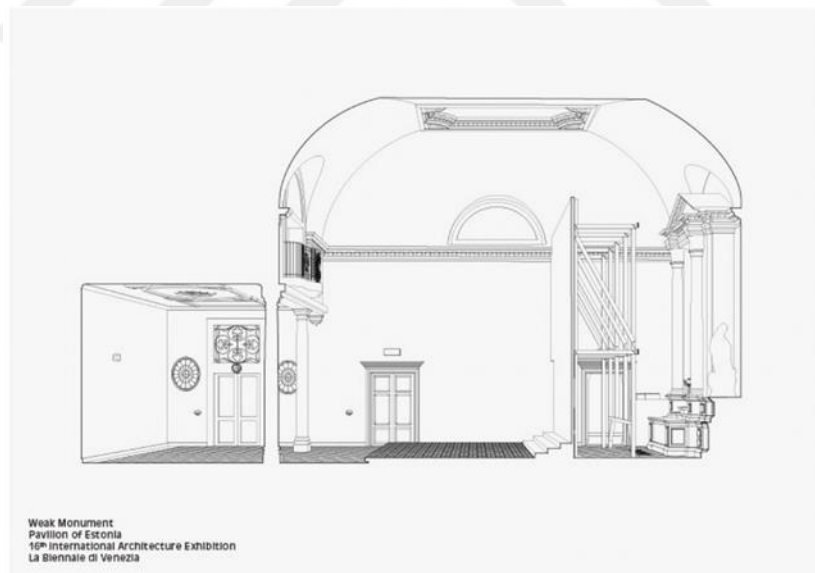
| A perspective section drawing of the Weak Monument installation, showing the construction of the installation within the baroque church.
